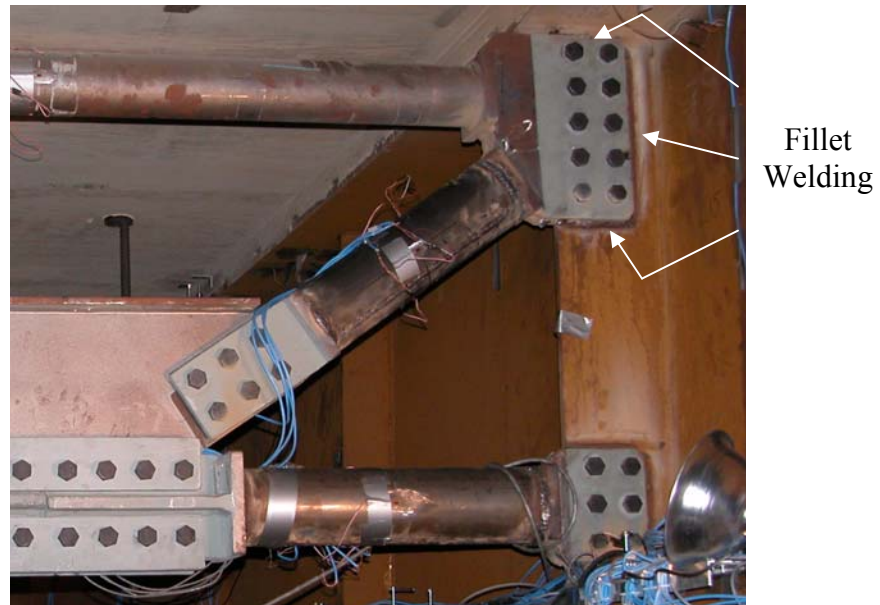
Welding around the gusset plates in contact with the connection plate to the outside girder, G3, courtesy of FHWA.
